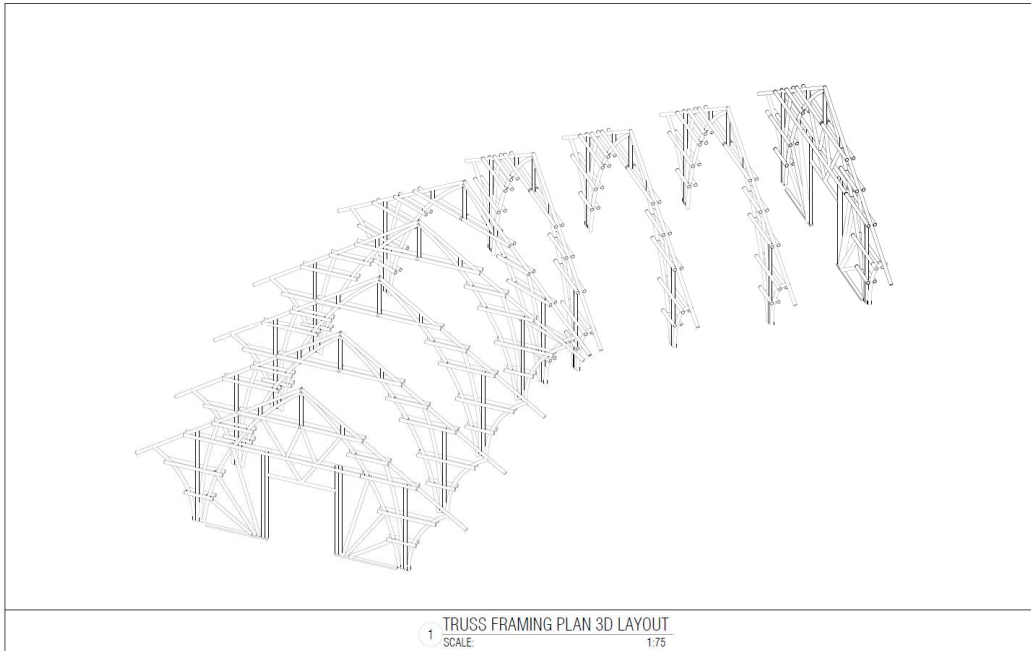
Bambusa-blumeana truss framing plan 3d layout of the case-study building: Kanya Kawayan weaving centre. Drawing not to scale. Drawings provided by Base-Bahay Foundation.
